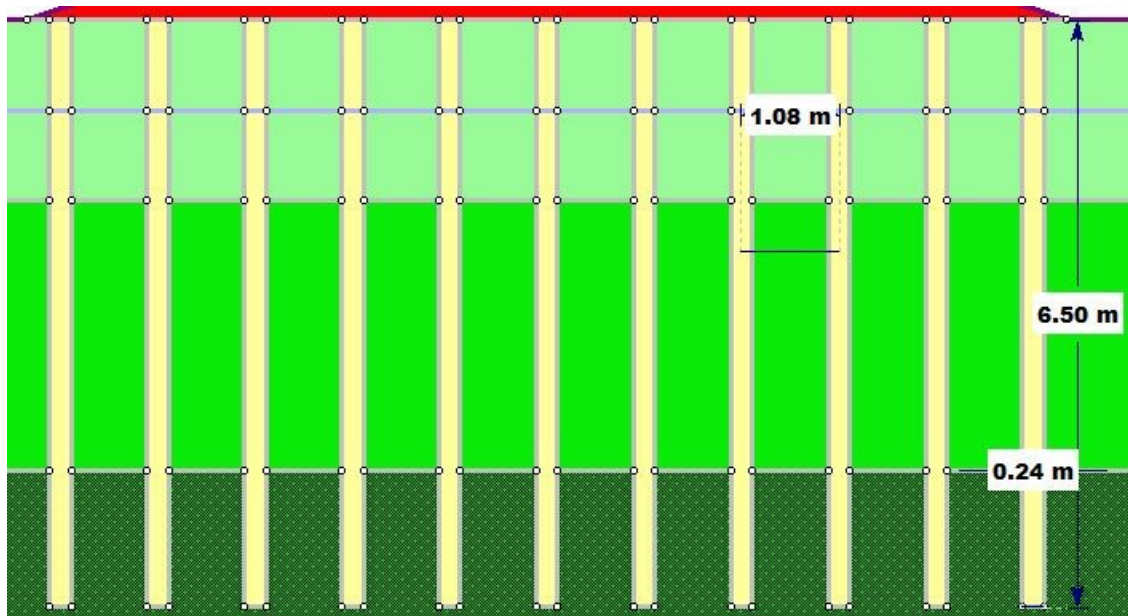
Dimensions for the wooden piles under the railway embankment.
